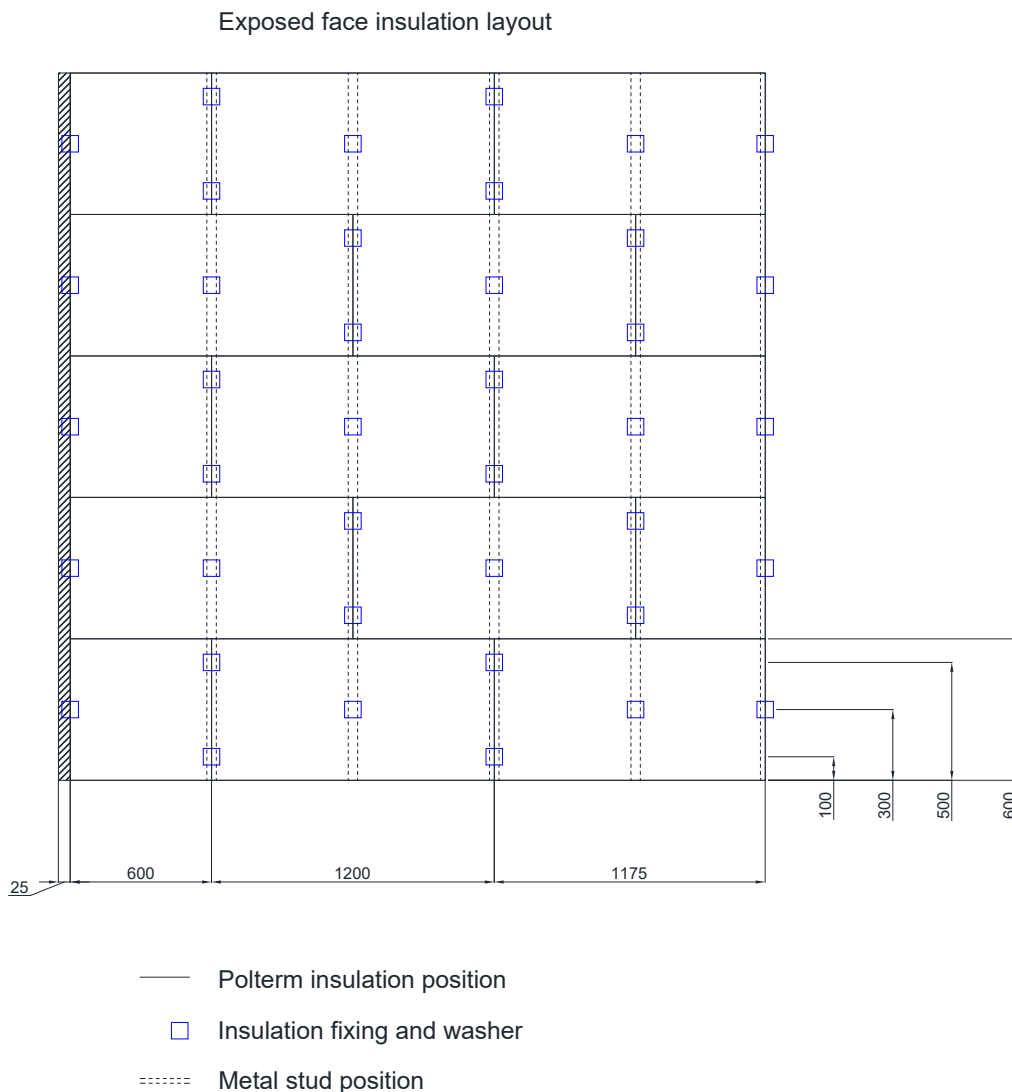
Exposed Face Elevation Outer Layer - Isover Polterm Max layout and fixing pattern.
